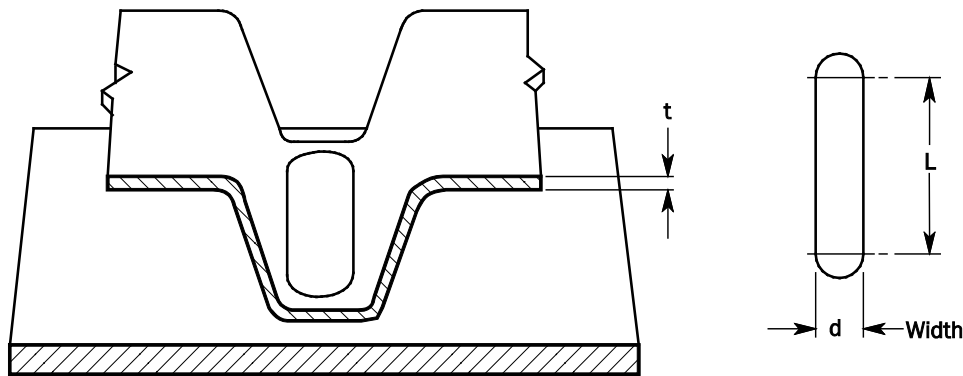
Arc Seam Welds - Sheet to Supporting Member in Flat Position
